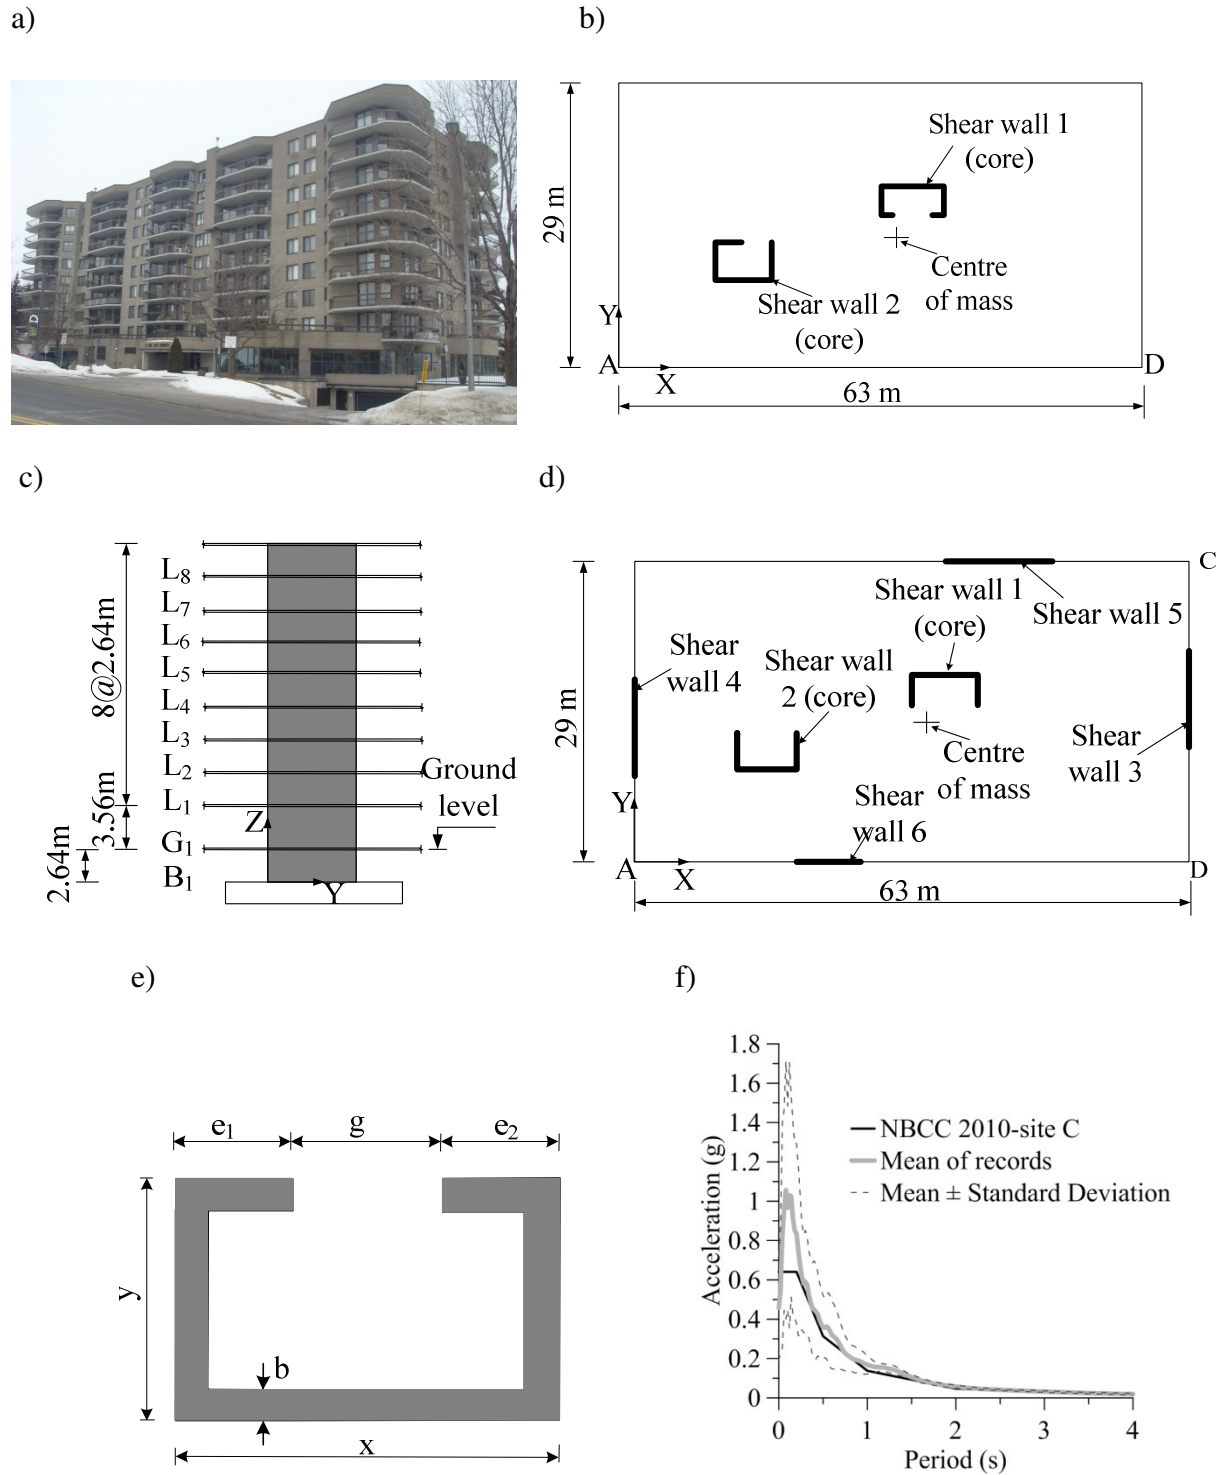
Building studied: (a) 10-storey RC building; (b) typical plan view; (c) typical vertical cross section; (d) typical plan view with added shear walls; (e) typical shear wall cross section; (f) mean response spectrum of the selected ground motion records versus NBCC 2010 design spectrum for site class C.
